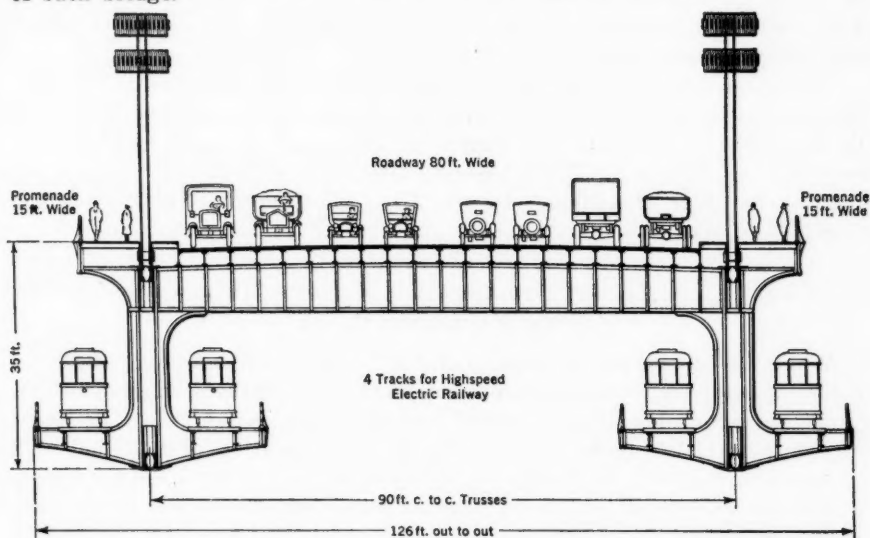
TYPICAL CROSS-SECTION, PROPOSED DESIGN FOR 179TH STREET SUSPENSION BRIDGE
